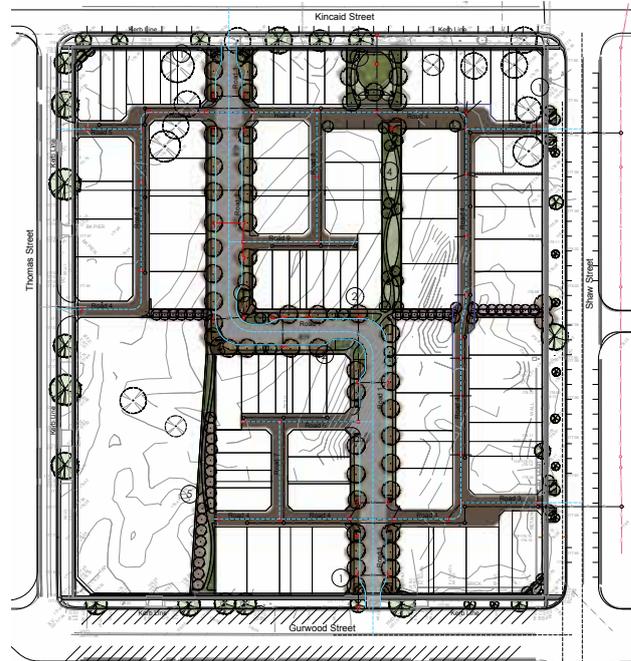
LANDSCAPE MASTER PLAN
